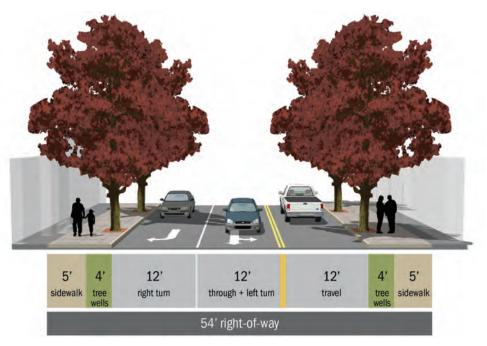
Conceptual Cross-Section for Ochoco Street – West of Main Street within existing right-of-way (looking east)
